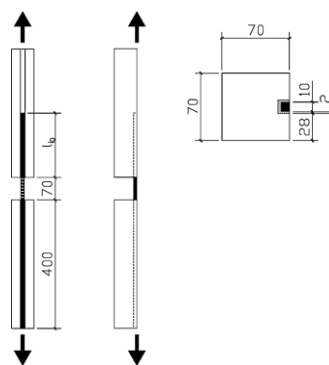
Test set-up for investigating the impact of the anchoring length (Johnsson et al. 2007).
